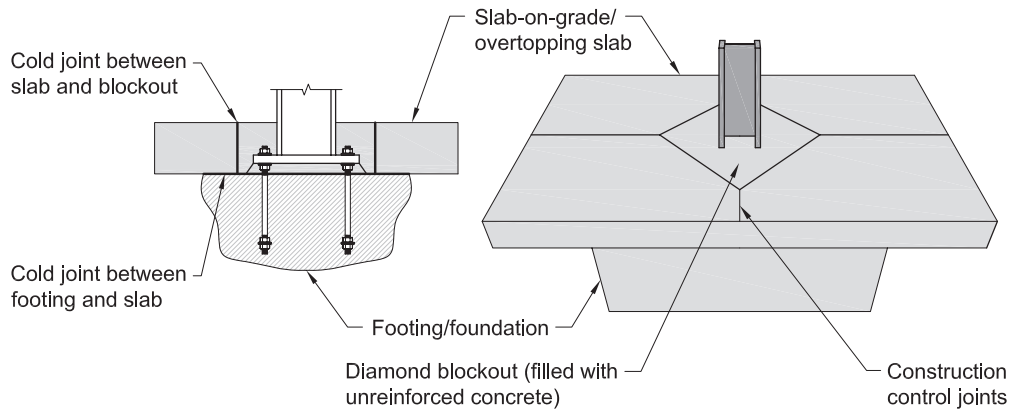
Blockout connections resulting in shallow embedment of base plate connection.
